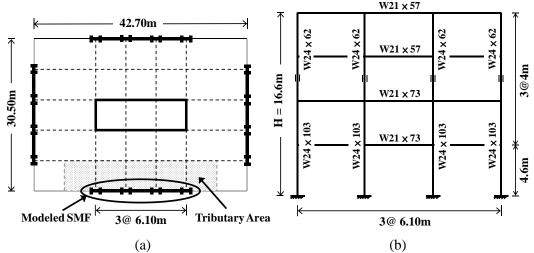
(a) Plan view of the four-story building; (b) elevation view of the modeled prototype SMF with member sections listed in English units (in. \times lb/ft) [4]
